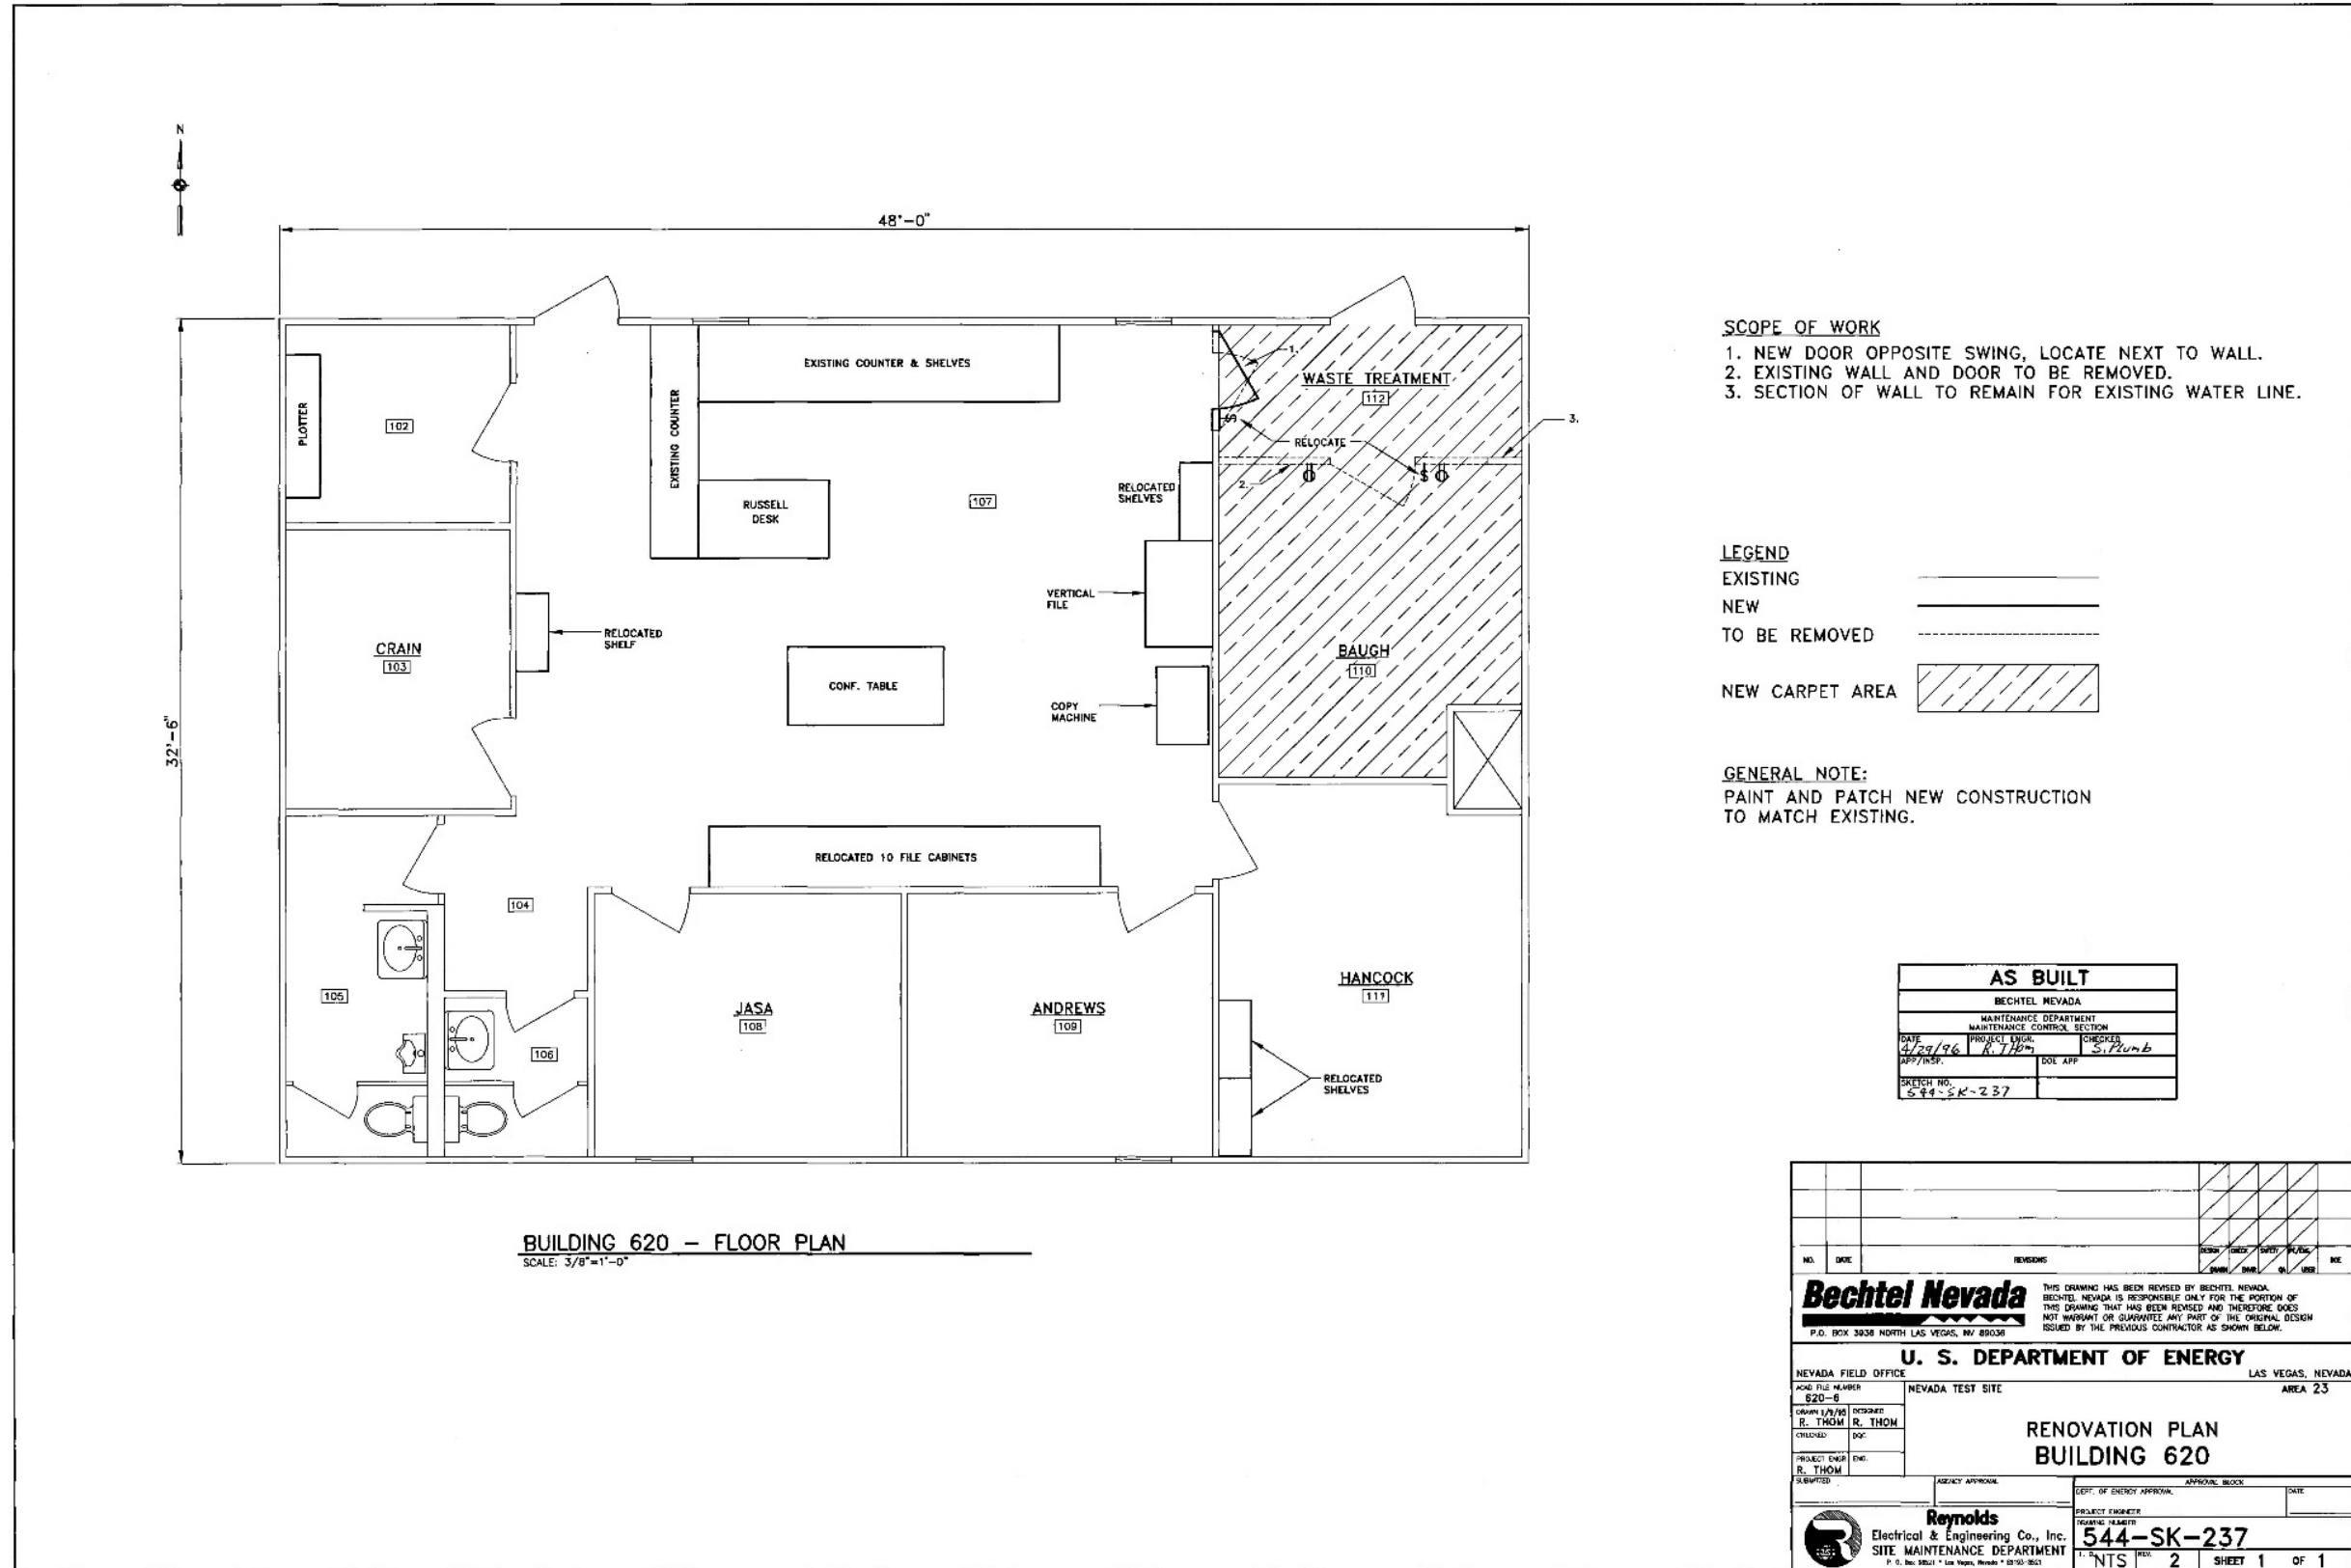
Renovation plan for Building 23-620 (REEC0 1996).
